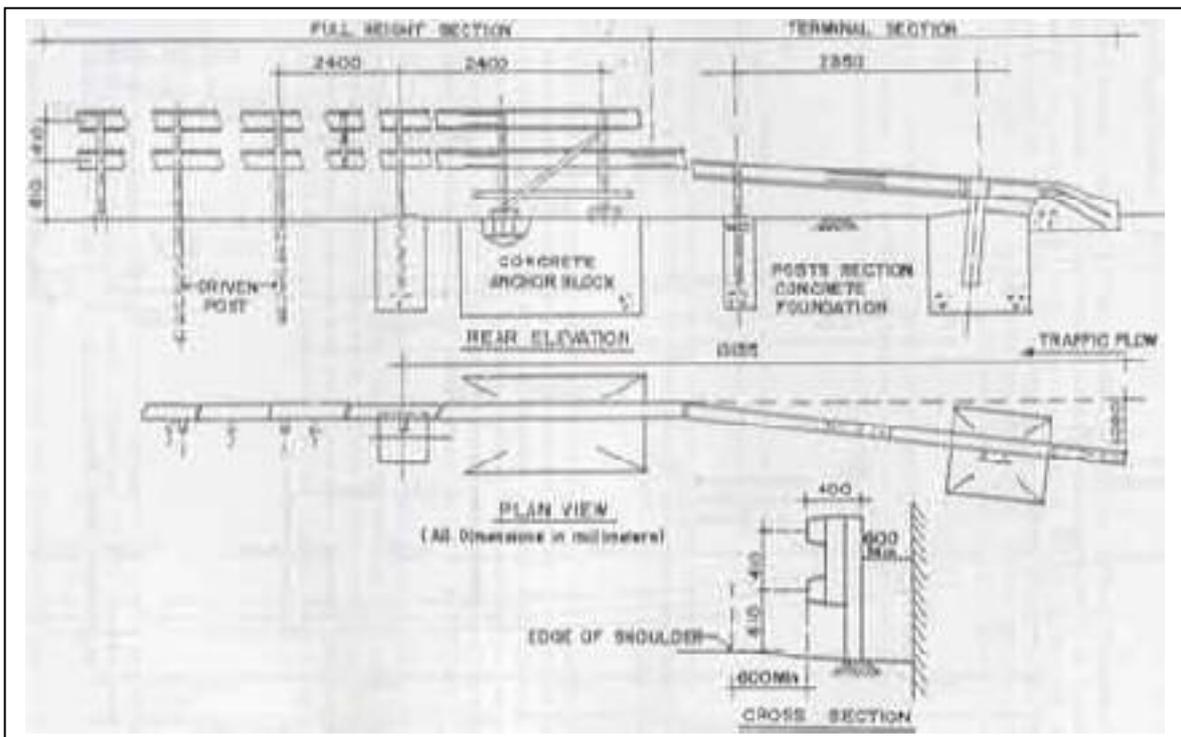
Open box beam barrier – double railed and untensioned (Adapted form UK Highway Construction details, Vol 3, Section 2)
